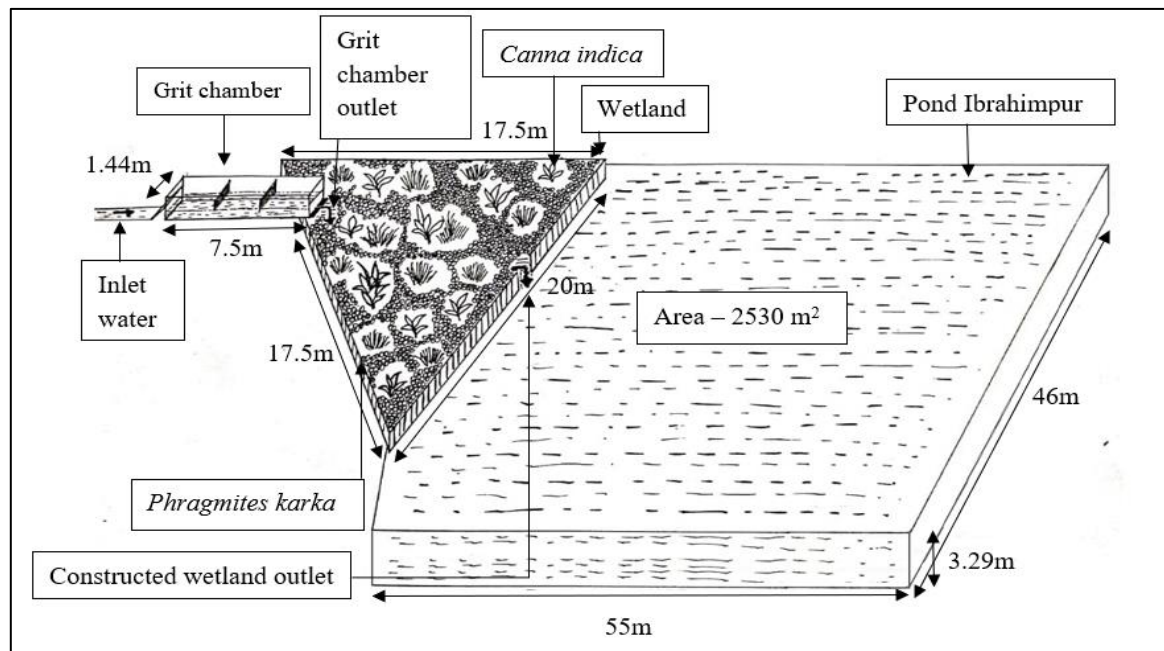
Layout of Constructed wetland at Ibrahimpur Village
